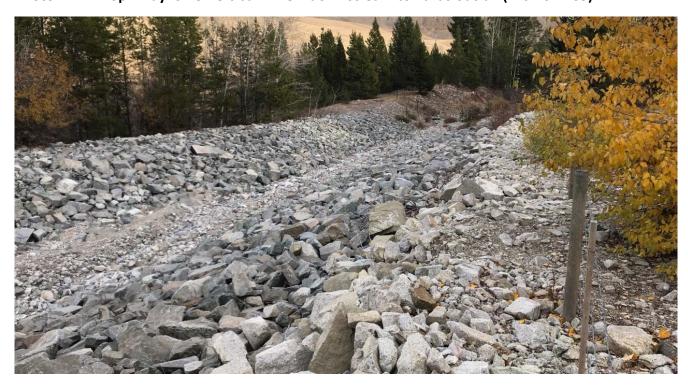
Seepage collection ditch view towards Bethlehem Dam. Flow observed, along with local ponding at channel low points (TRJ-2017-07)
